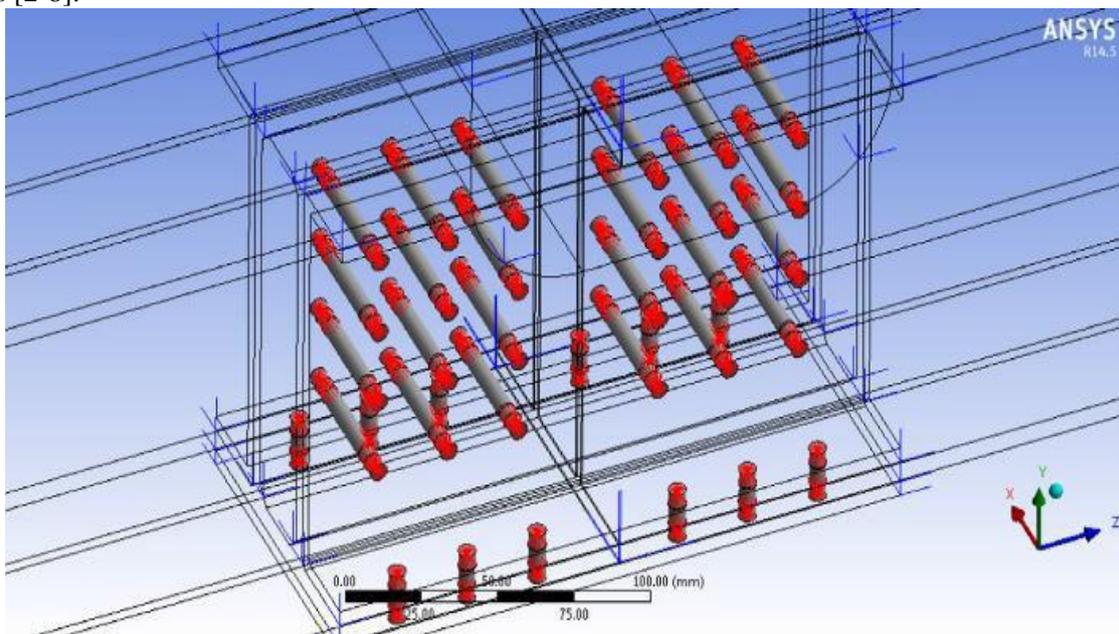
Bolt connection modelled with BEAM188 elements [8].
